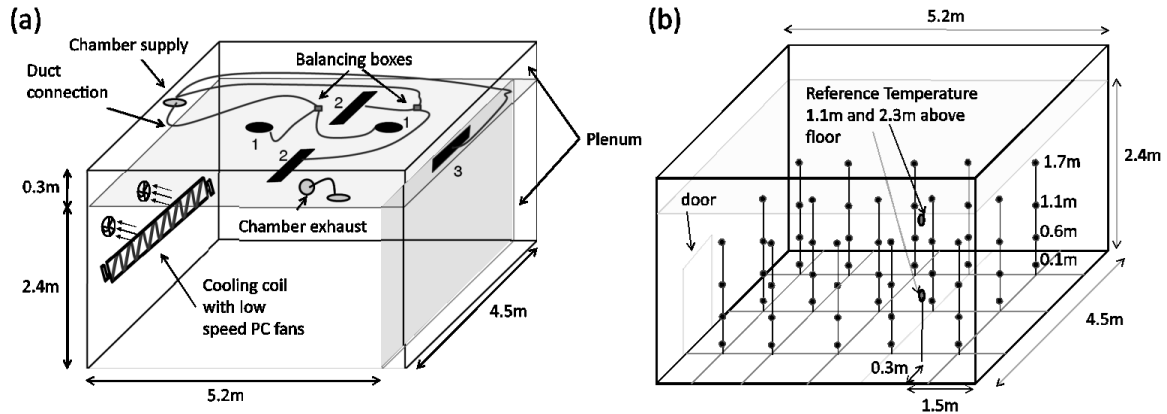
Chamber geometry and sensor positions; (a) Ductwork for three installation configurations 1: Ceiling diffusers, 2: Ceiling linear slot diffusers and 3: High sidewall grilles or nozzles (0.1m from the upper frame to the ceiling); (b) The locations of sixty sampling positions.
